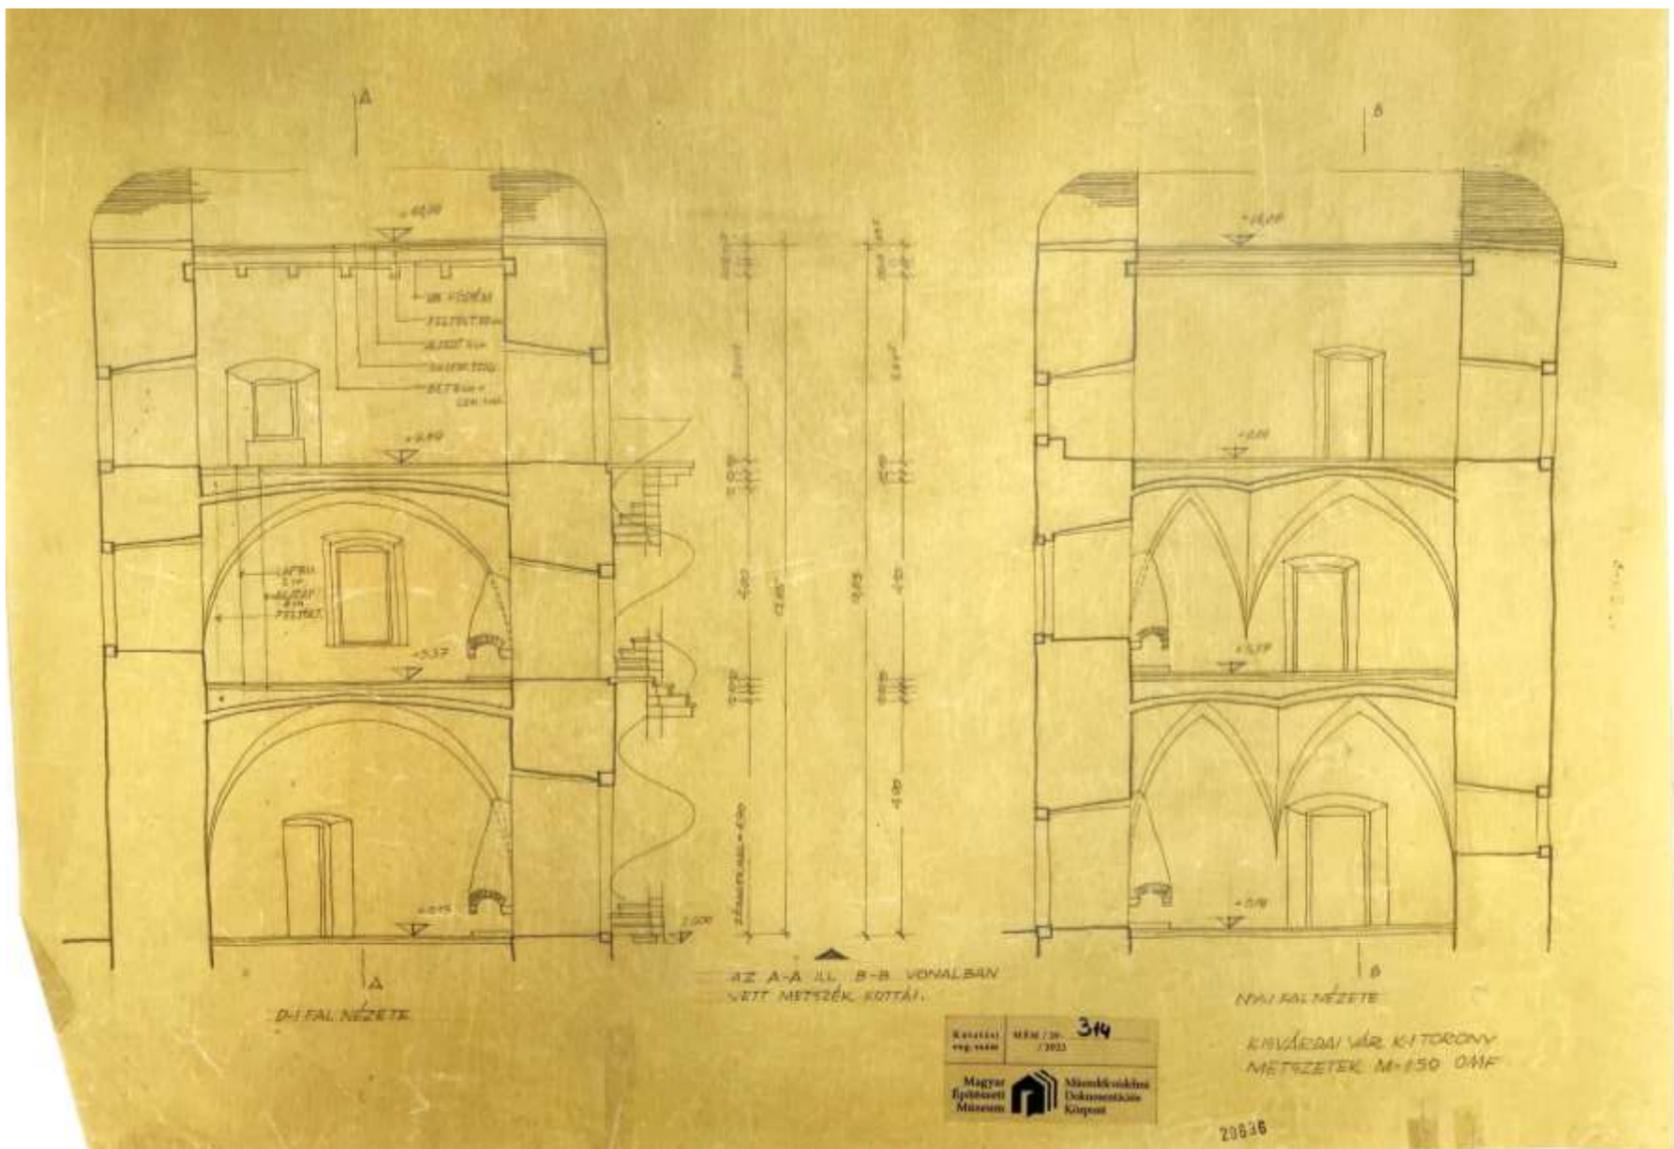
Plan for the southeast tower inside, by László Császár from 1960. (MÉM MDK Architecture Plan Collection, 29636)
